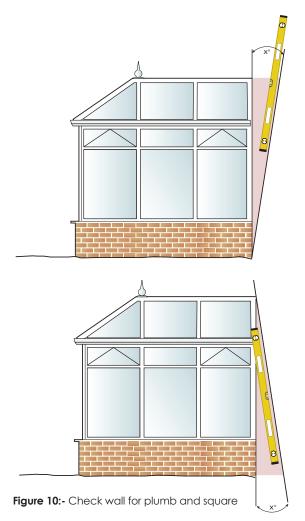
If the house wall leans backward, this indicates that some form of extension to the ridge will be needed as indicated in Figure 10. Whether the wall leans inwards or outwards, packers to the side frames and roof will be required as indicated in Figure 10.
